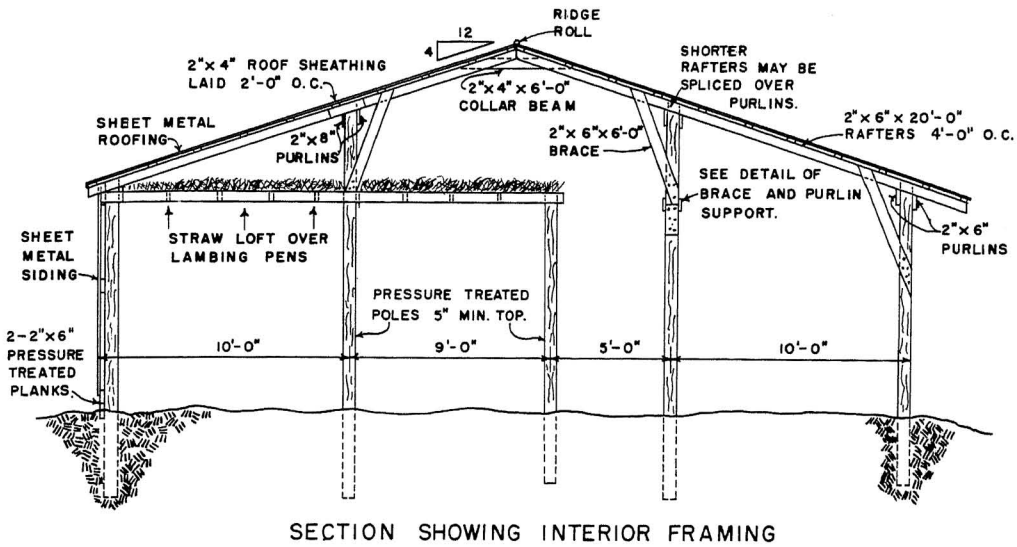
End framing and cross section views of sheep barn showing details of construction.
